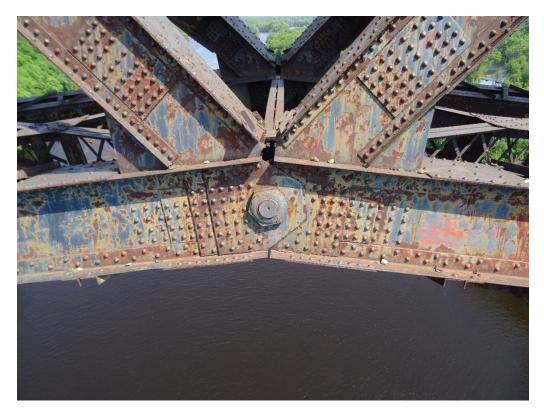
Photograph of Arcola Bridge Pin Detail Photo 3.
